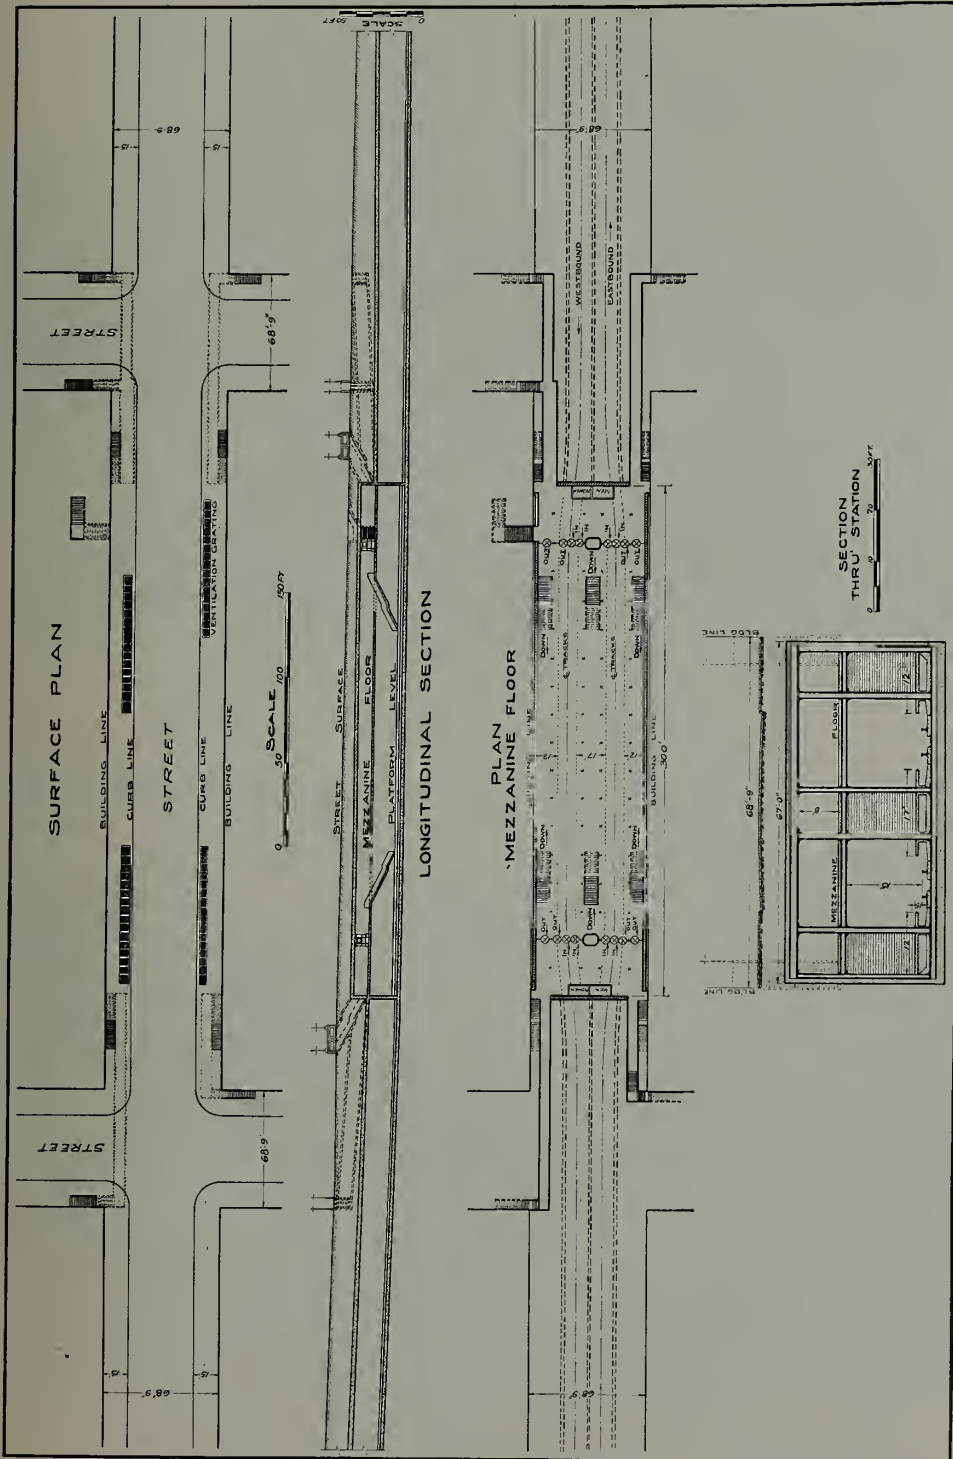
TYPICAL LAYOUT FOR TWO TRACK SUBWAY STATION.
